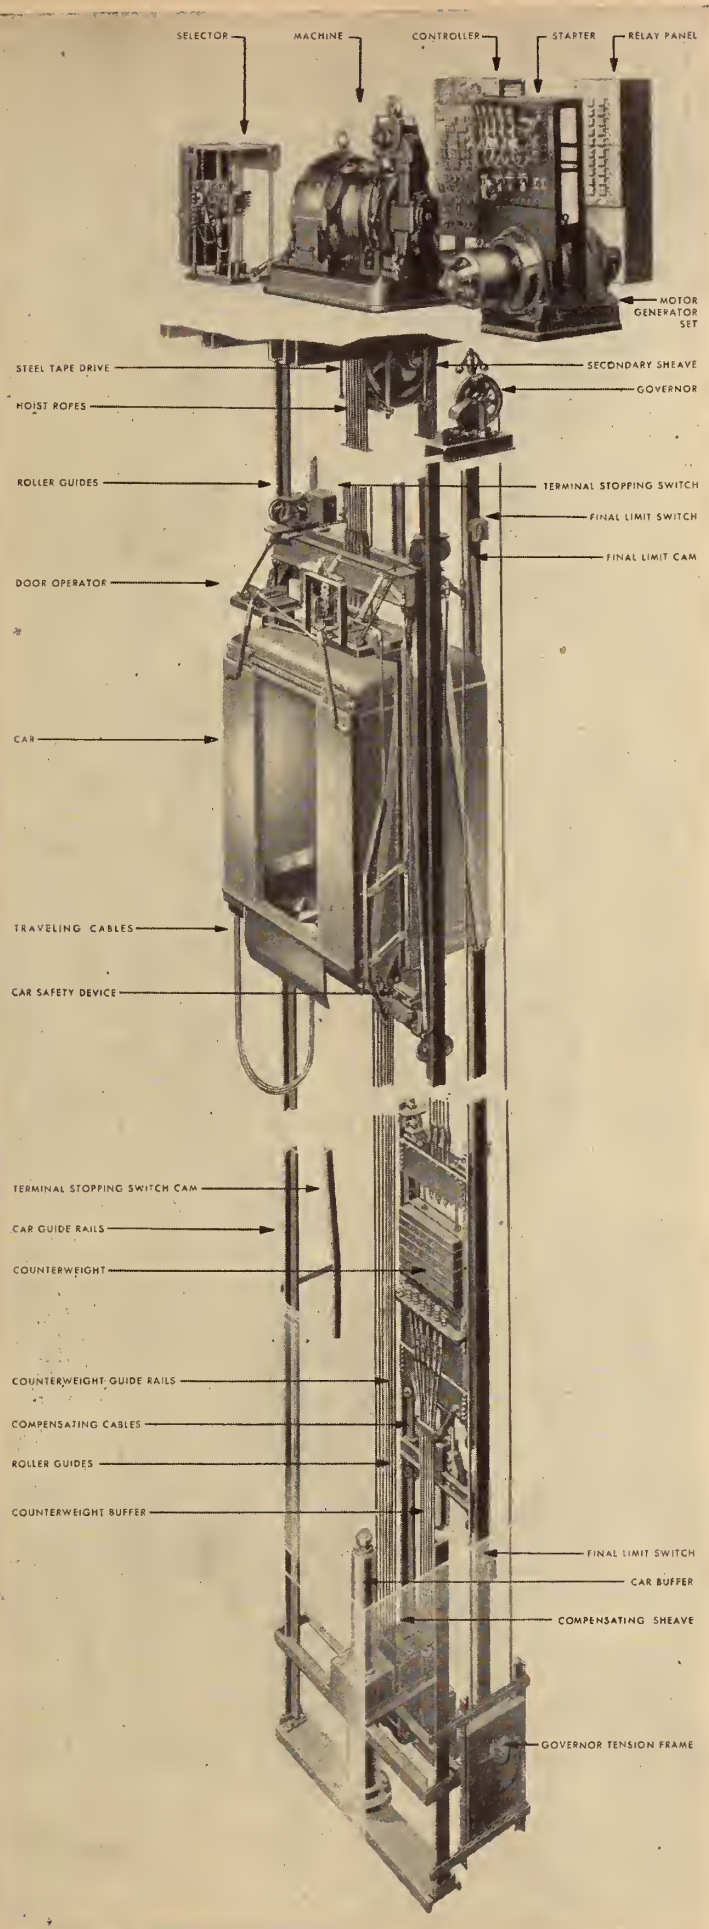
Passenger elevator with gearless machine arranged for double wrap and with variable voltage control.
